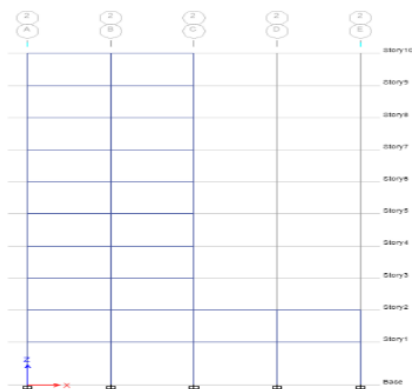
elevation view of M2 model Fig 4 elevation view of M3 model
